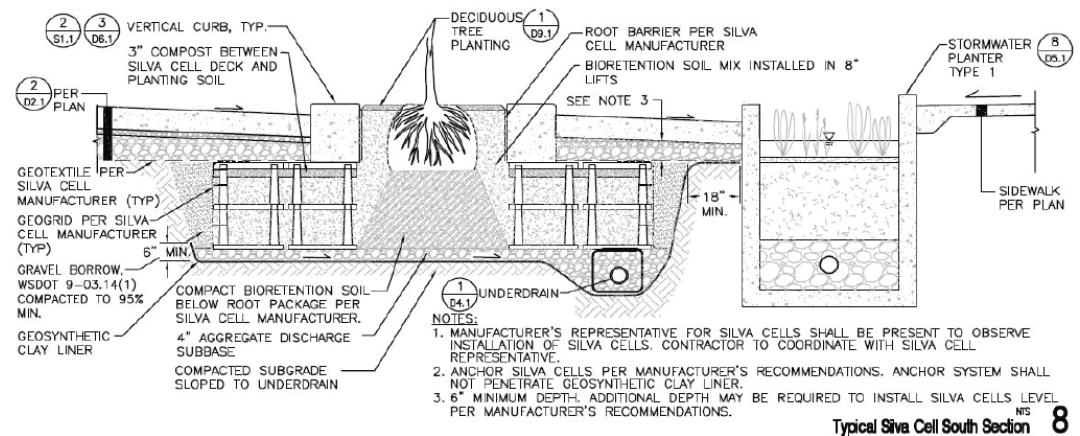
Details for a Suspended Pavement Silva Cell System with Stormwater Planters
